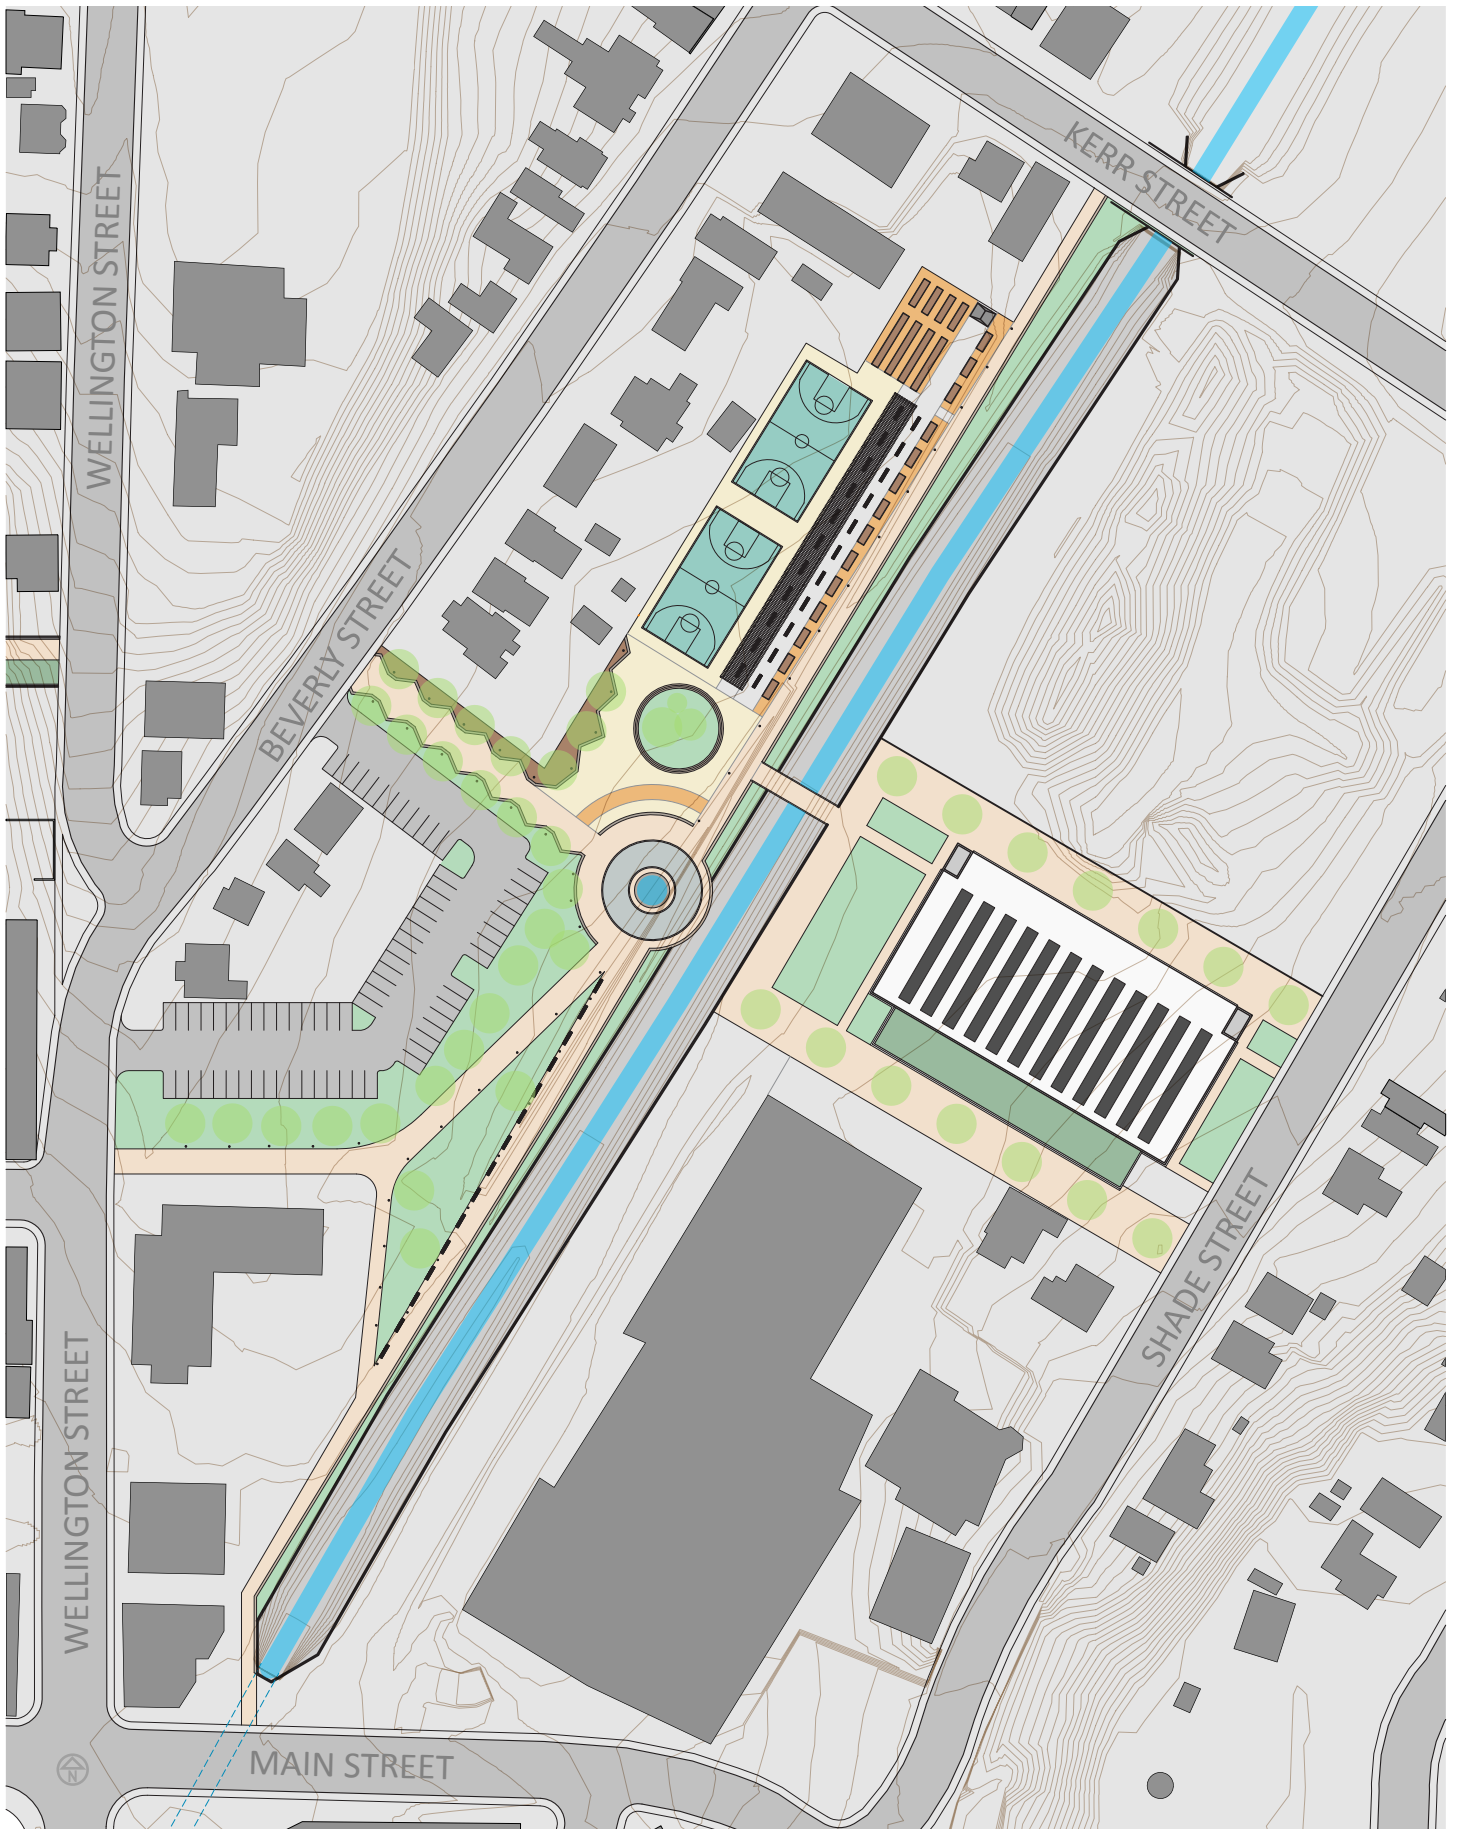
Siteplan of Mill Creek Garden (1:1500).
